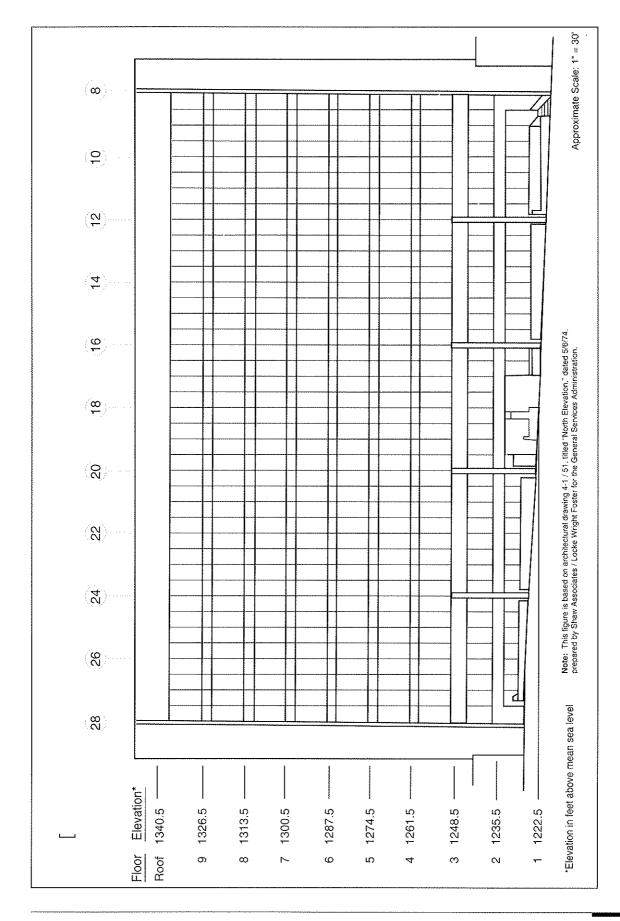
North elevation — nine-story portion of Murrah Building.
